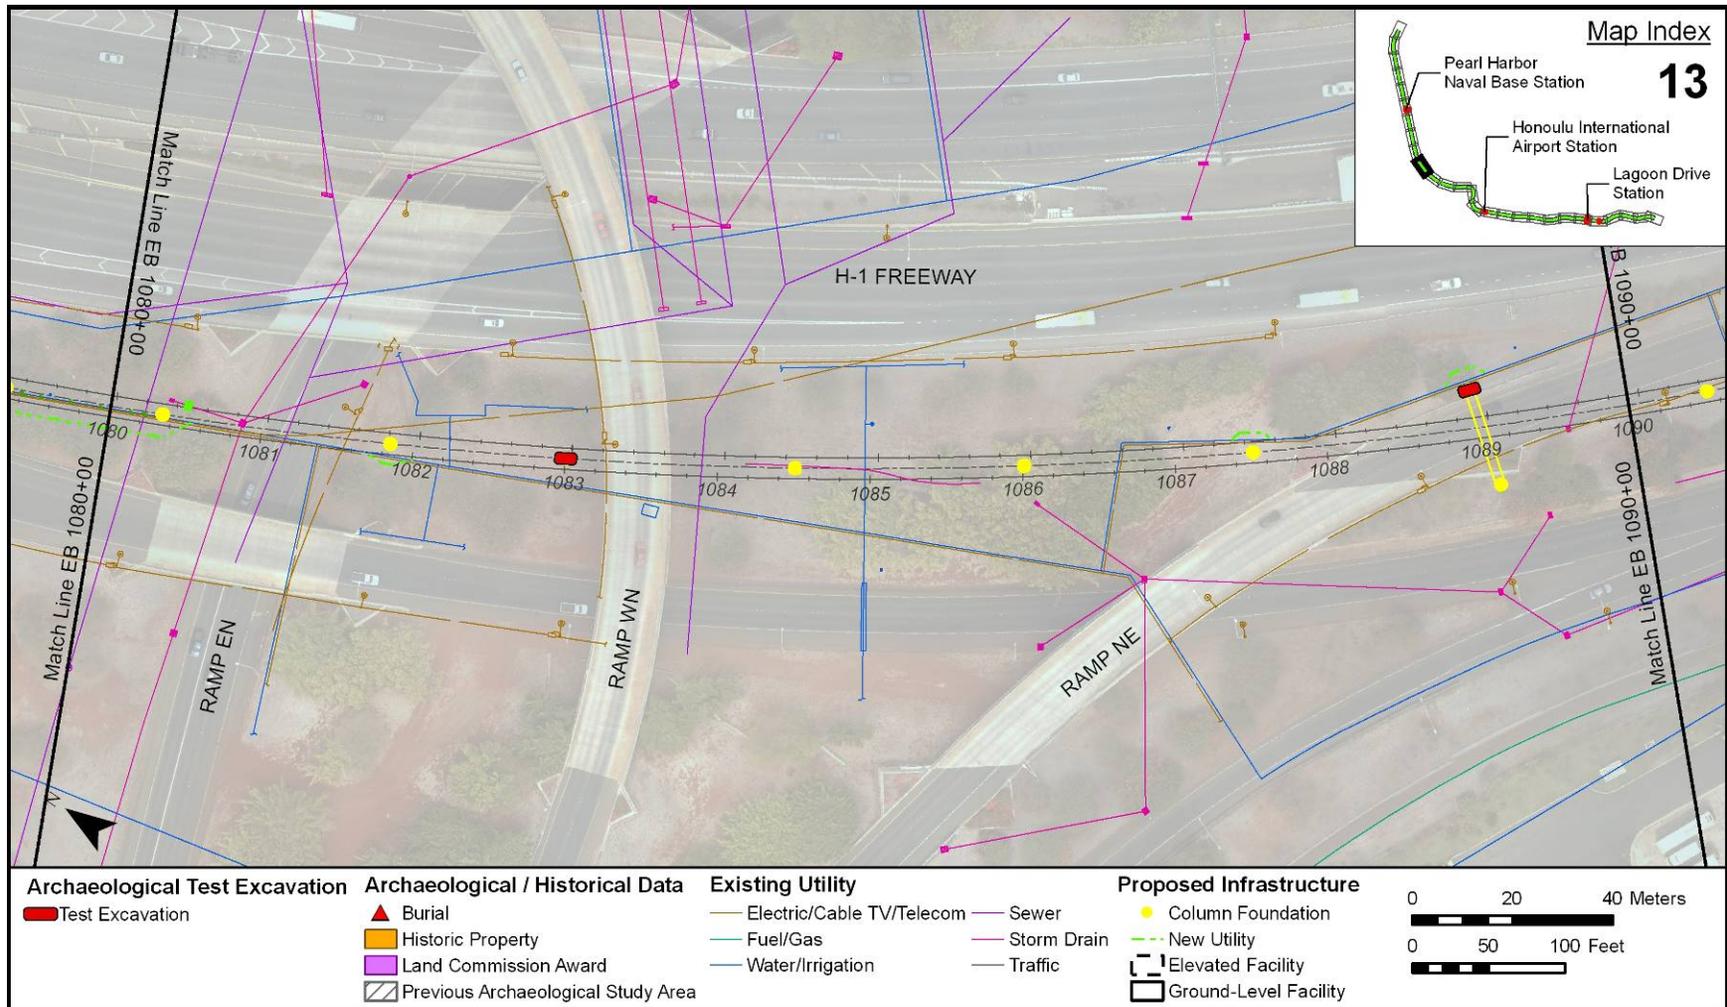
Map Sheet J 13, two 10x3 column foundation excavations @ 1083+00 & (mauka) 1089+00
